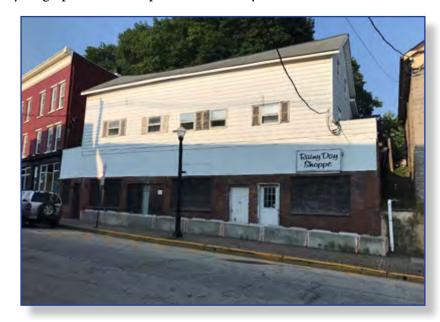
Deteriorating condition of the former Rainy Day Shoppe building at 12-18 Main Street.
